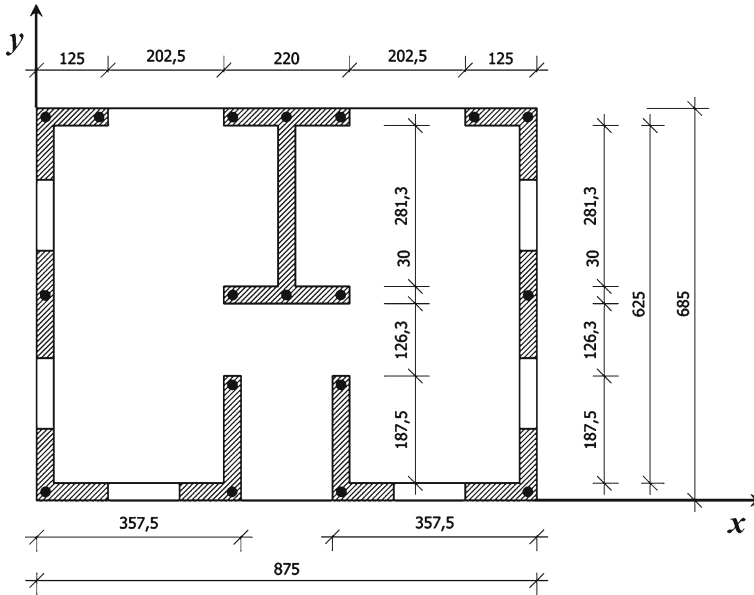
Floor plan of the prototype building with marked positions of tie-columns
